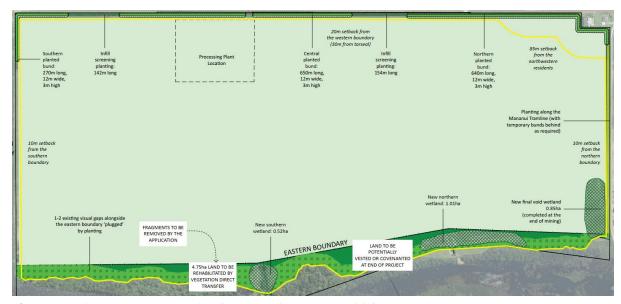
Planting Mitigation Plan (Source: Glasson Huxtable)
